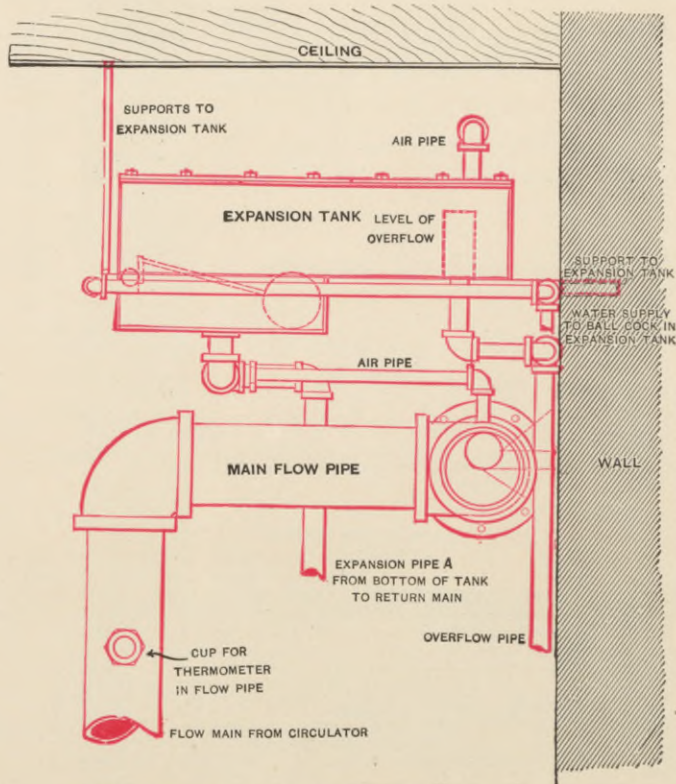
Details at F of Air Pipe, Expansion Tank, etc.
